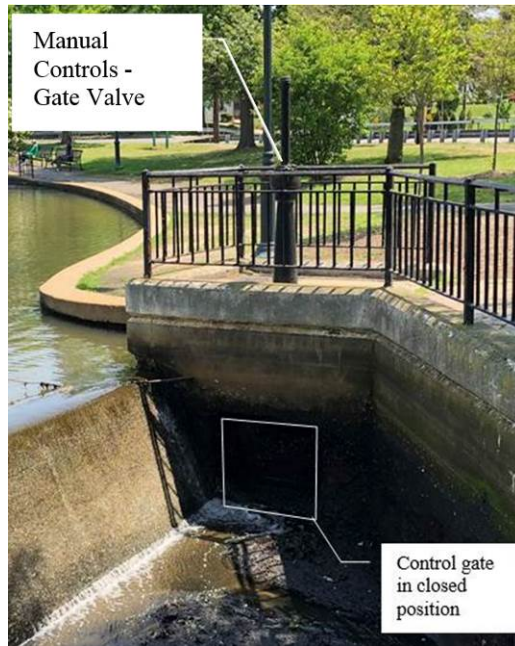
Photograph of existing Silver Lake weir at low tide
